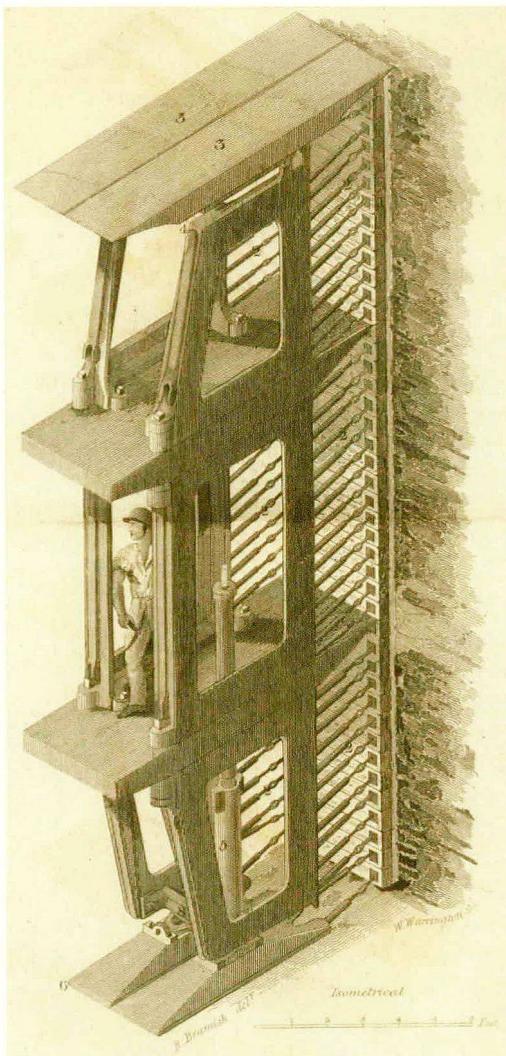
One of the cast iron frames of the tunnelling shield. With 12 frames side by side the working face was 12,5 m x 6,8 m, the others not shown. There were two 8-hour shifts a day with 36 miners working at a time.<sup>8</sup>
